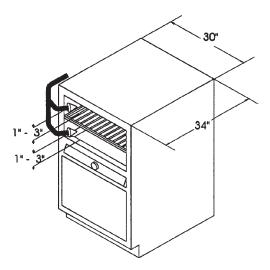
Model NL-UB Nozzle Placement, Upright Broiler.
